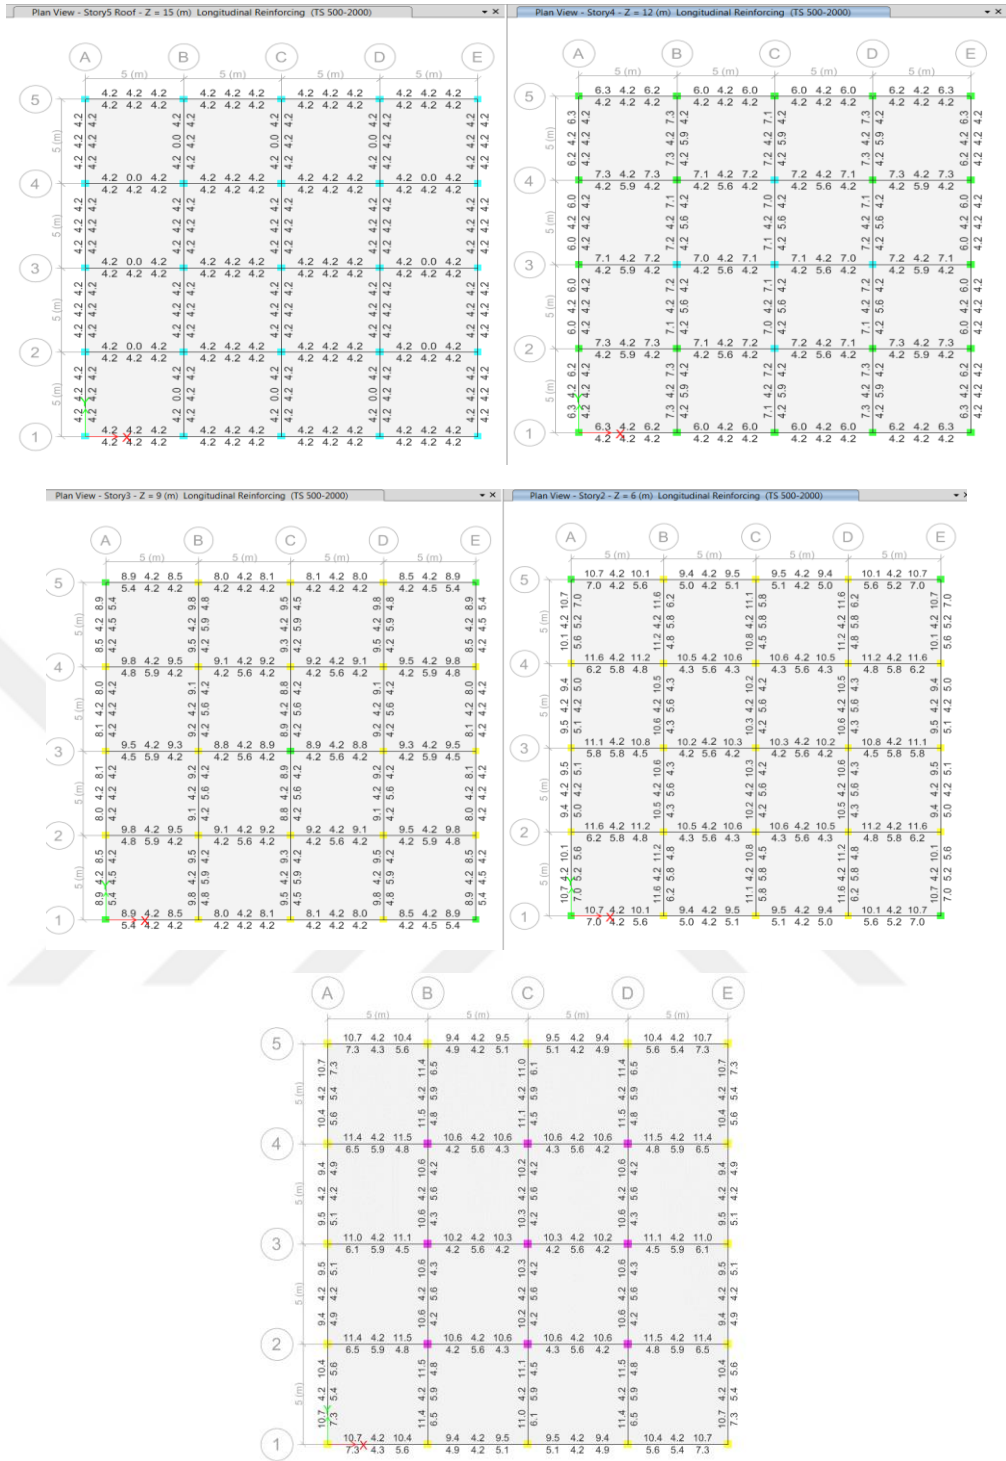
Beams longitudinal Reinforcement Area (cm<sup>2</sup>)
